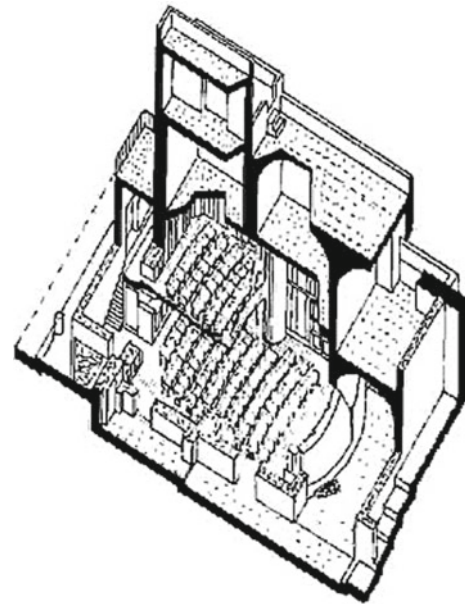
Grand meeting hall in the ground floor (listening hall). *Source* Umran and George (1997)
